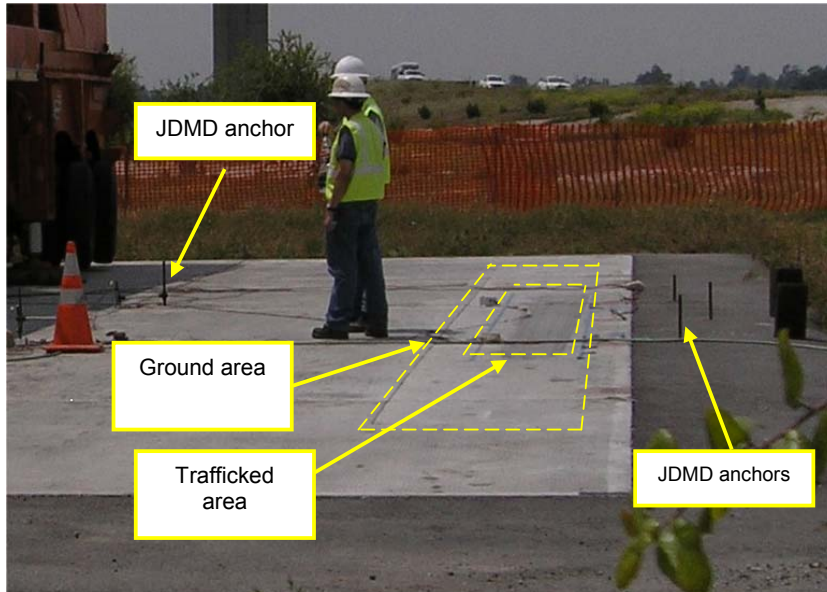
Trafficked test area and some JDMD anchors for Test 597FD.
